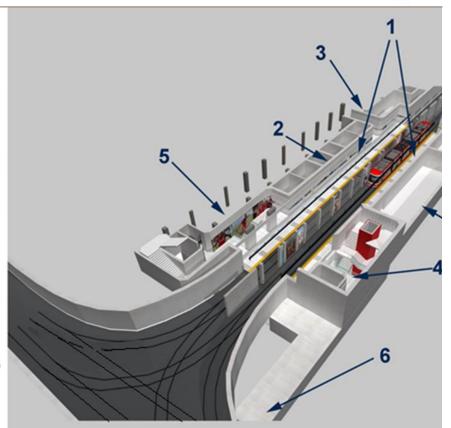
Queens Quay Station - CDRS Proposed Configuration
